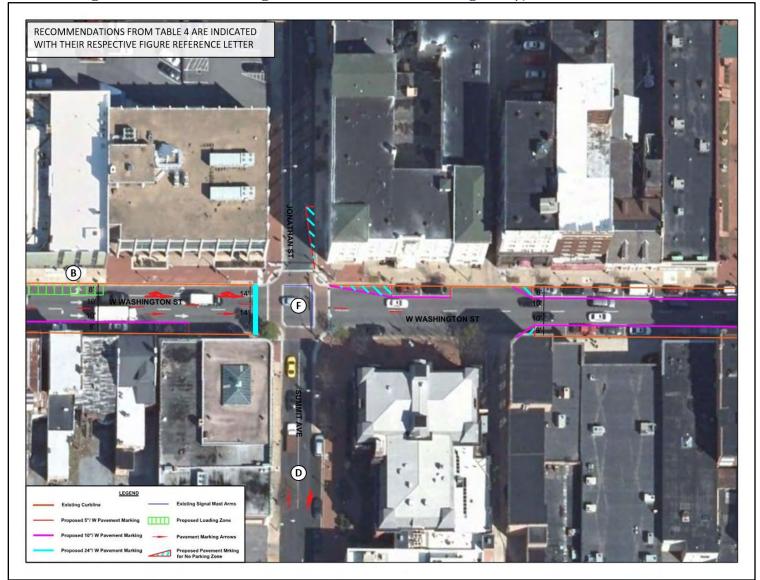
Pavement Marking Recommendations at Washington St/Jonathan St Intersection
